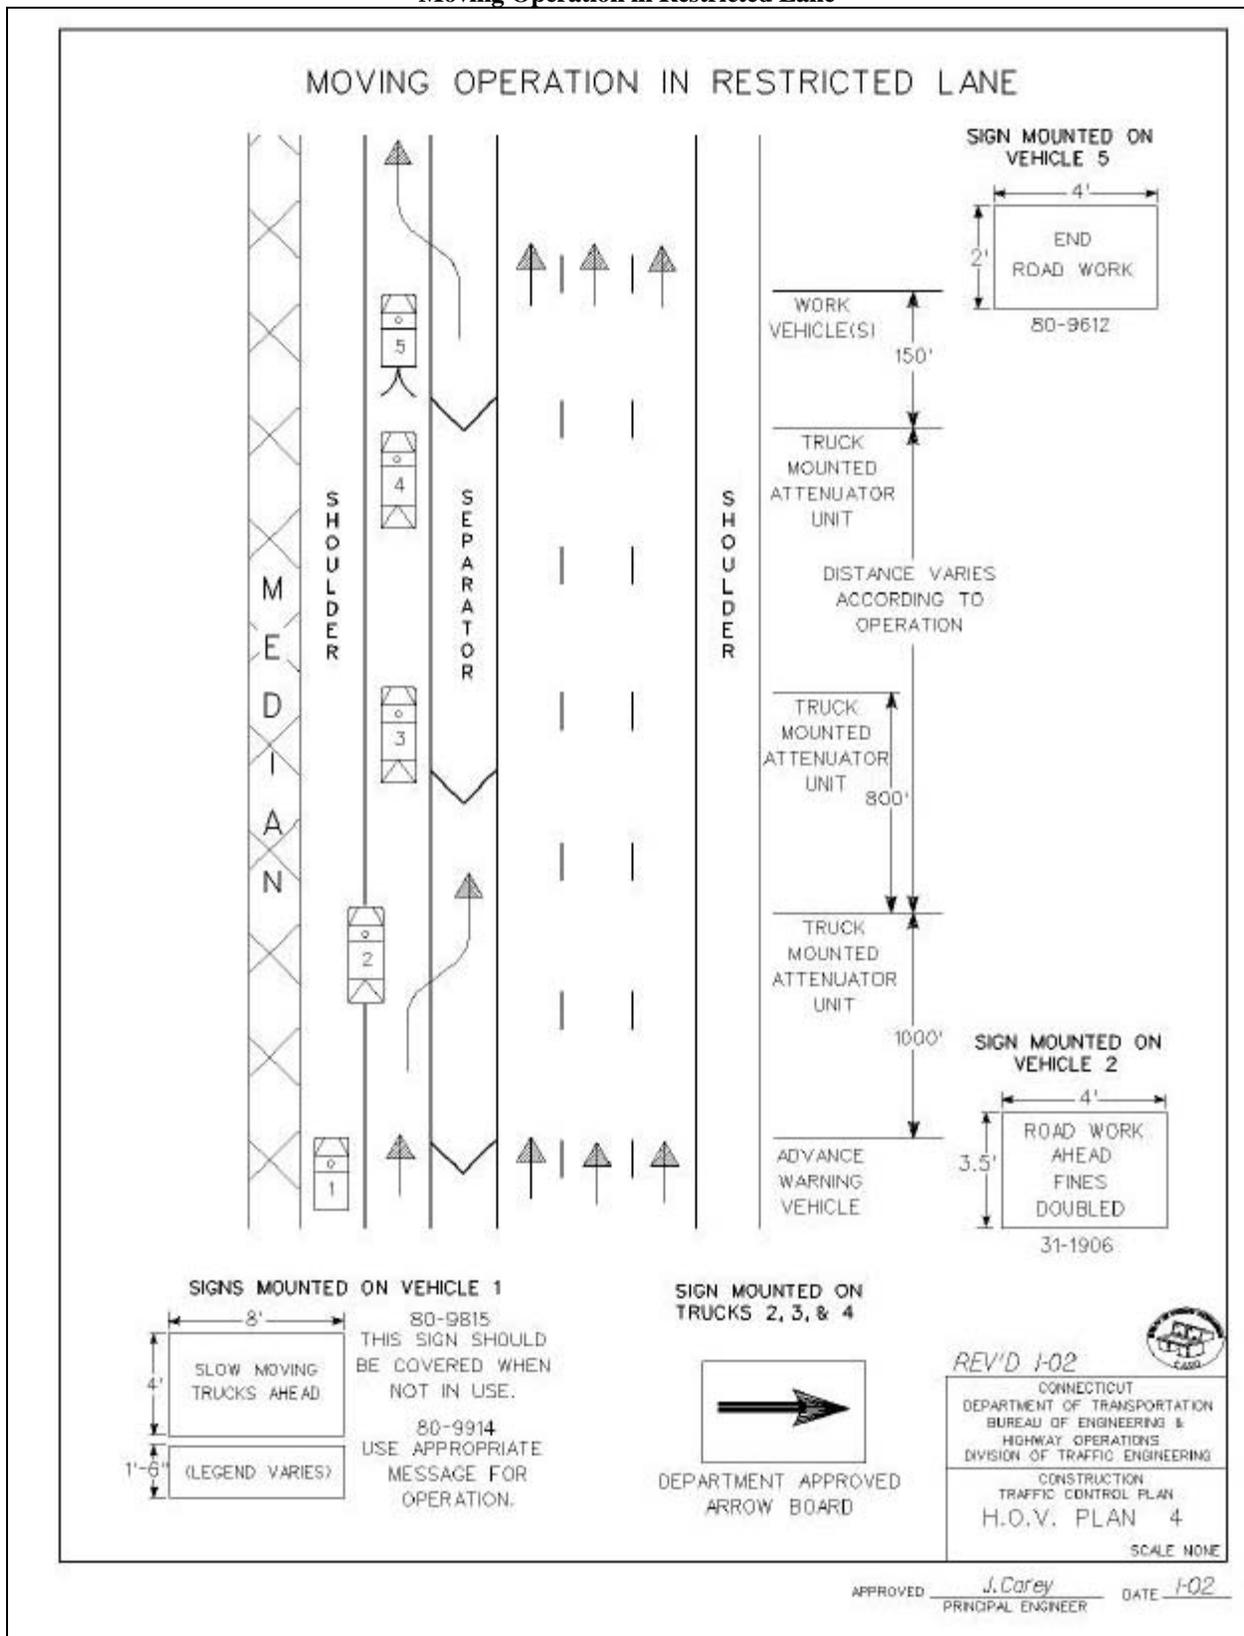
Traffic Control Plan—H.O.V. Plan 4
